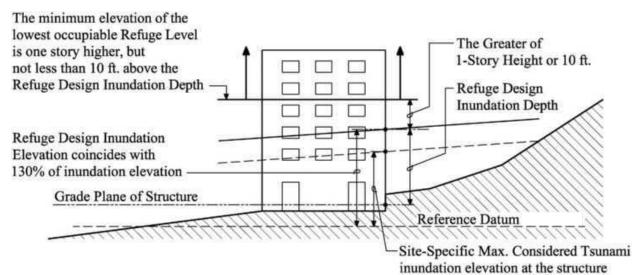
Minimum Refuge Level Elevation Illustration.
